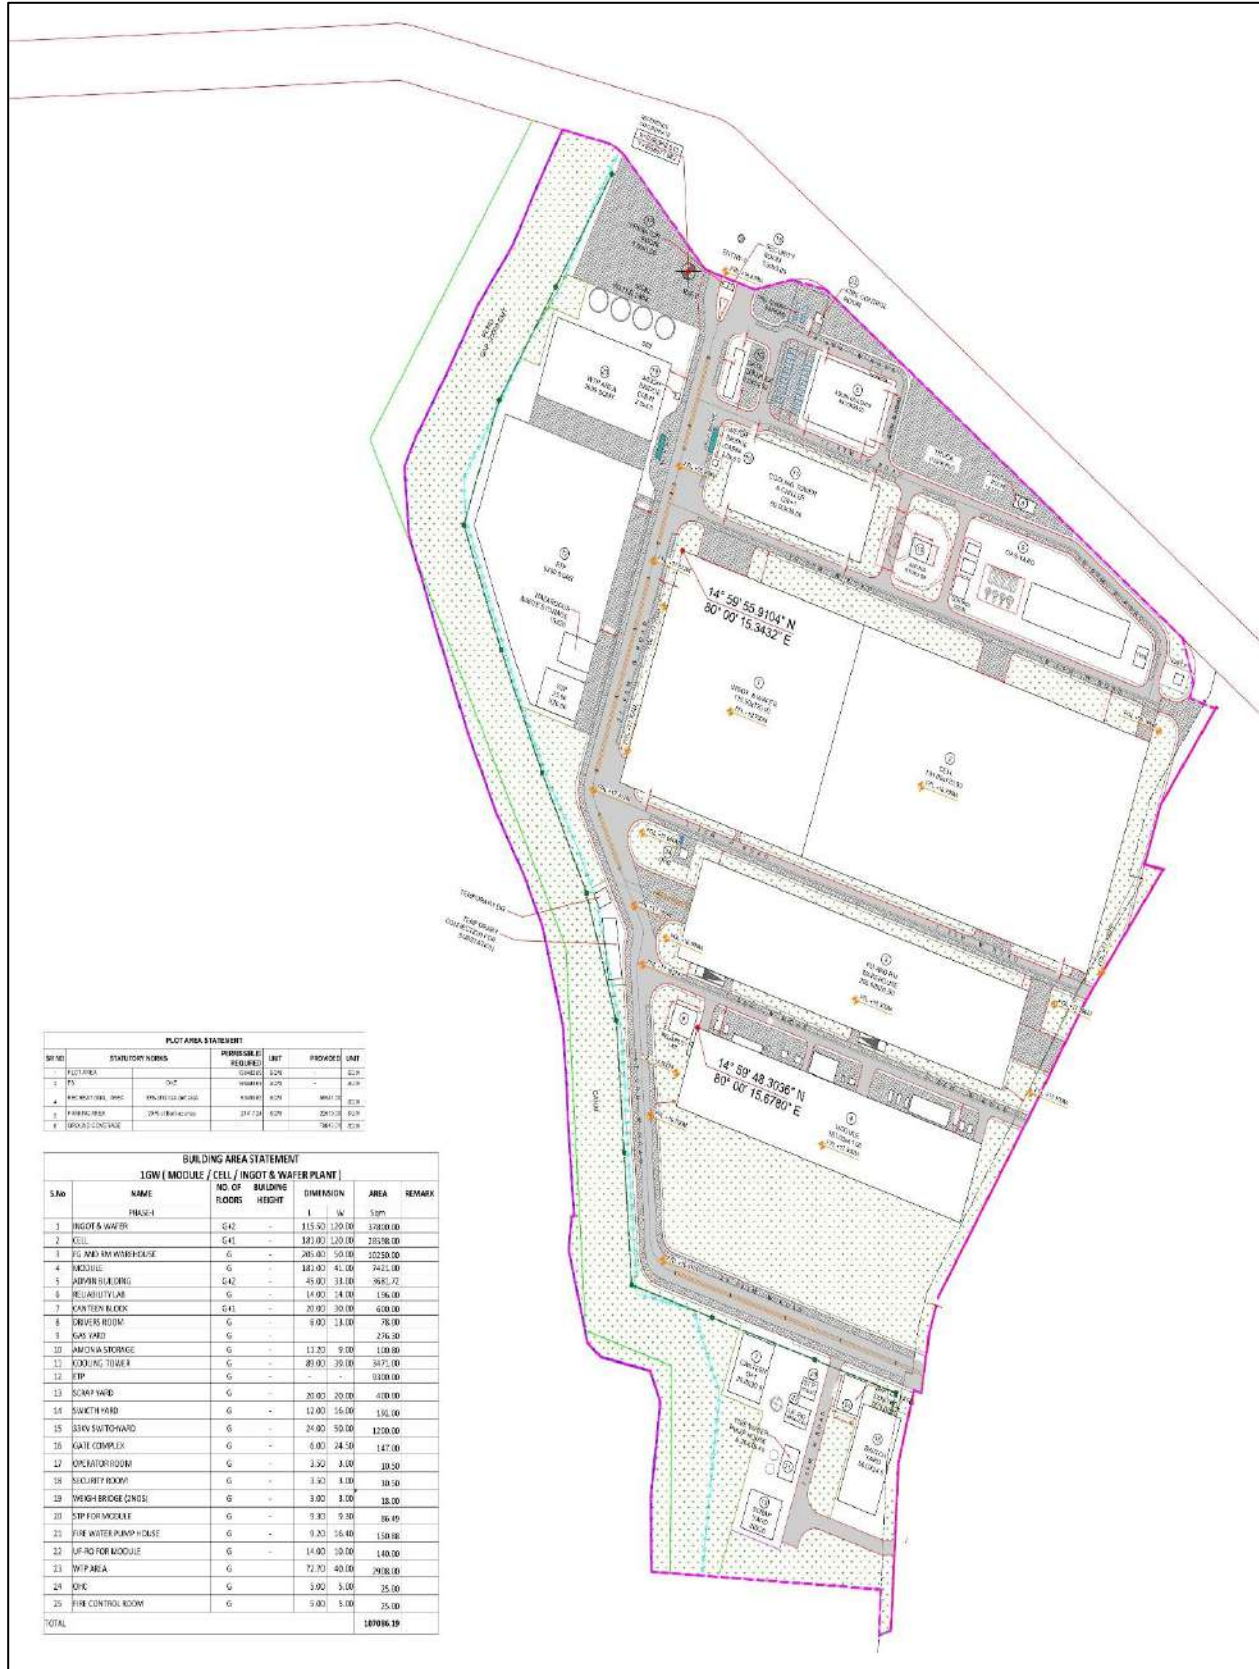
Plant Layout of Indosol Solar Pvt. Ltd.
